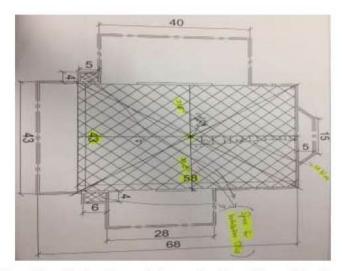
Identify the Centre Point on the Floor Plan of the Surau Facility
